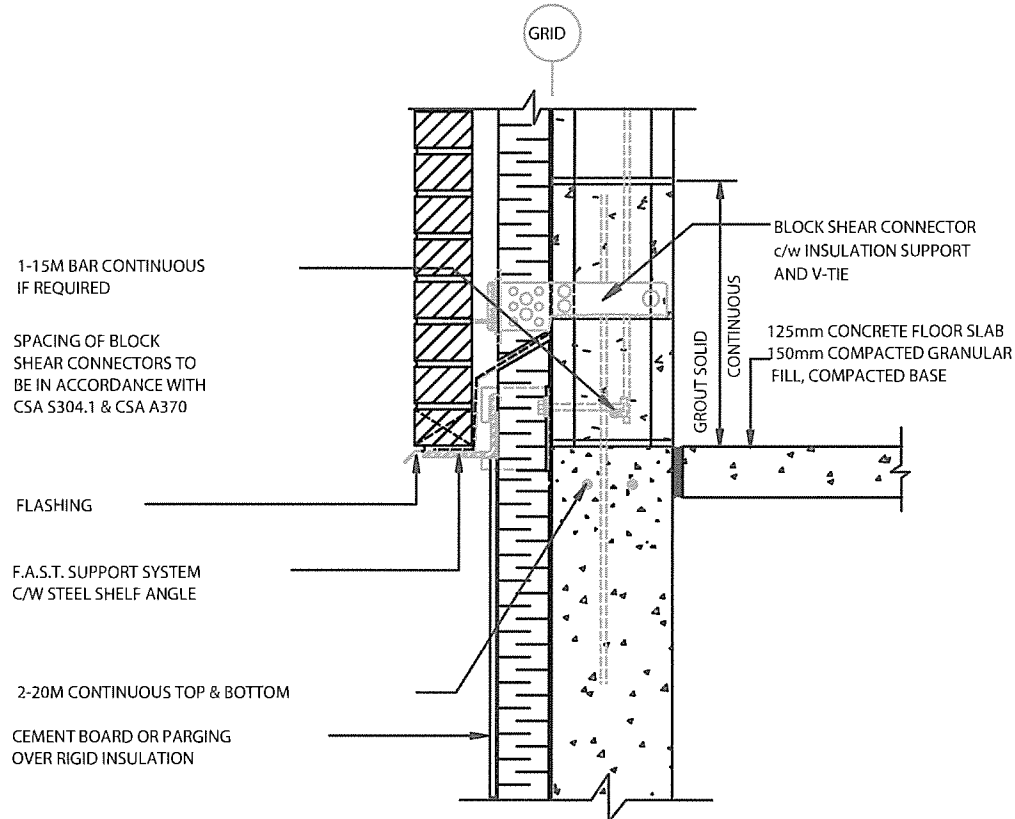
A BRICK VENEER / CONCRETE BLOCK - AT FOUNDATION BOND BEAM
